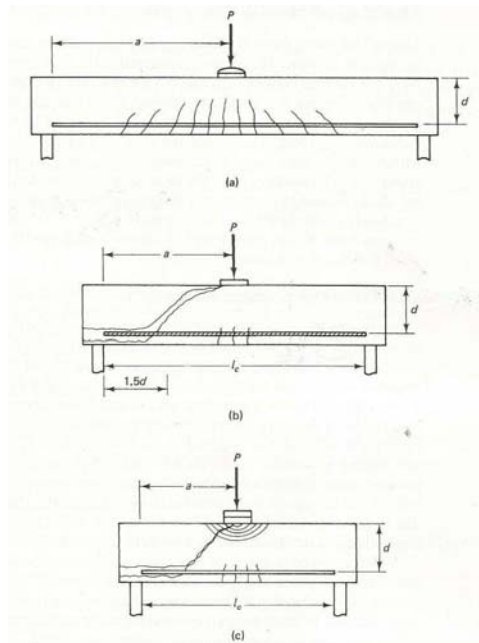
Failure pattern (a) Flexural failure, (b) Diagonal tension failure and (c) Shear compression failure [7].
